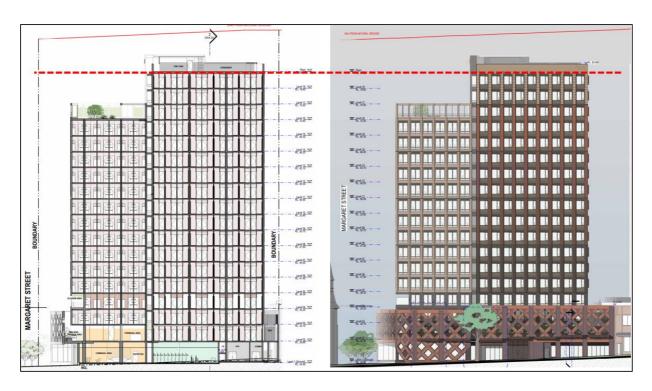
| Long section (left) and Regent Street elevation (right), indicating the 18-storey height plane (red dotted line) (Base source: RRtS Architectural Plans)
